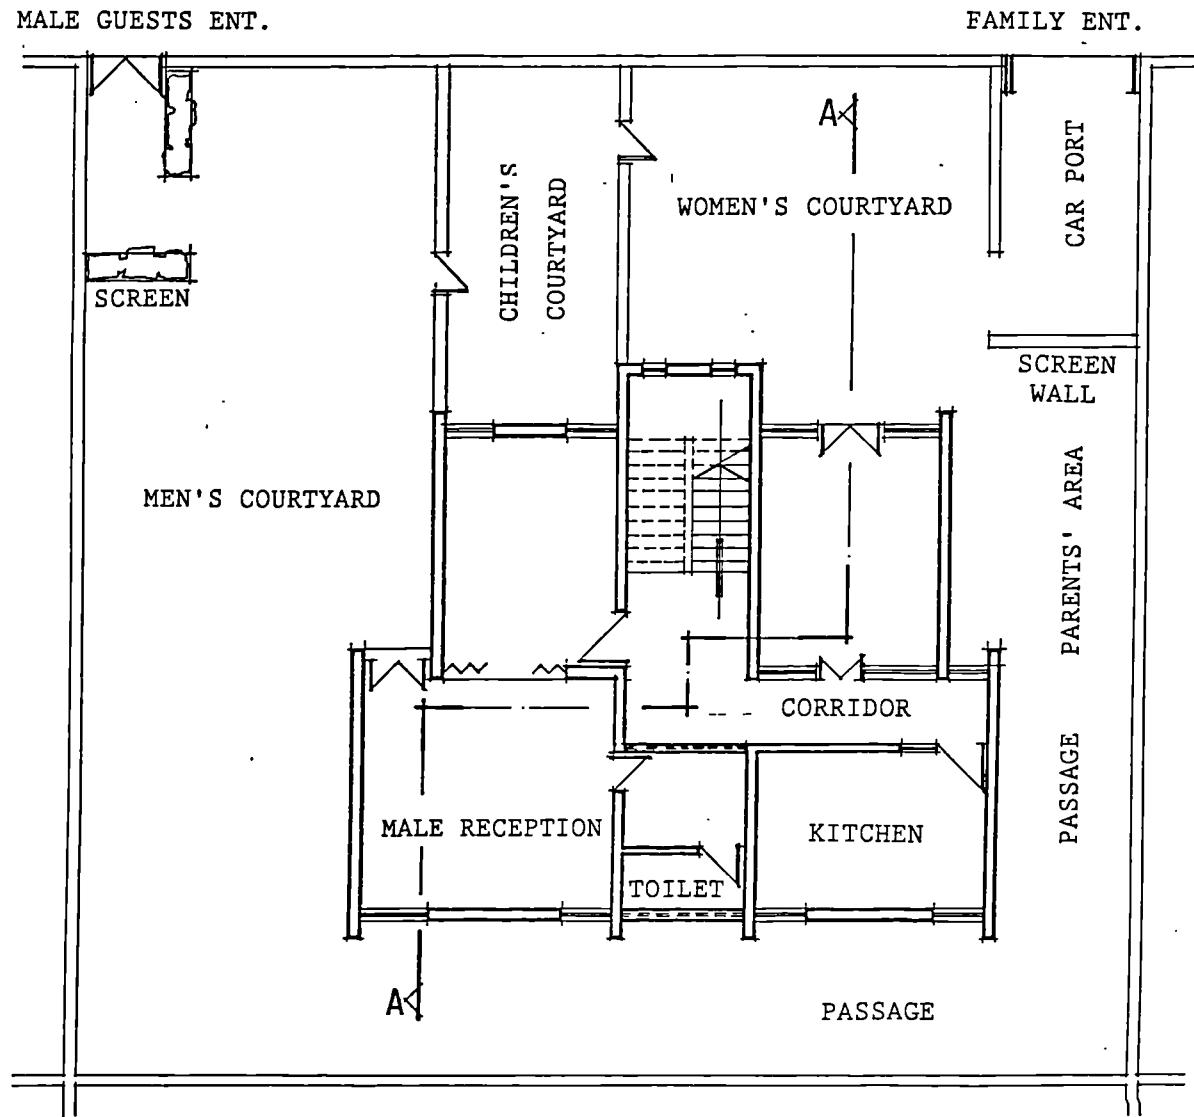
GROUND FLOOR PLAN (after modulation).
